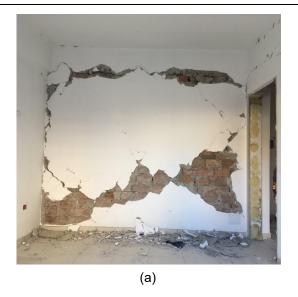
Damage of masonry infills inside the buildings in Durrës (photo: SUZI-SAEE).
